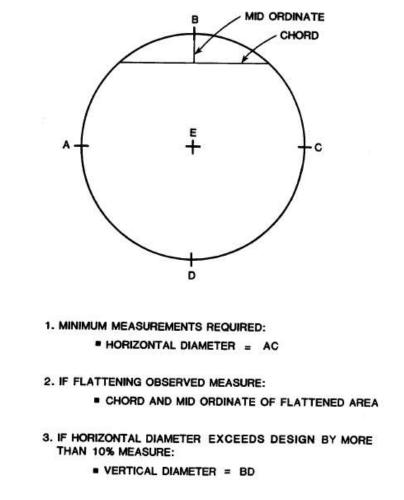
(Exhibit 81) Shape Inspection Circular and Vertical Elongated Pipe
